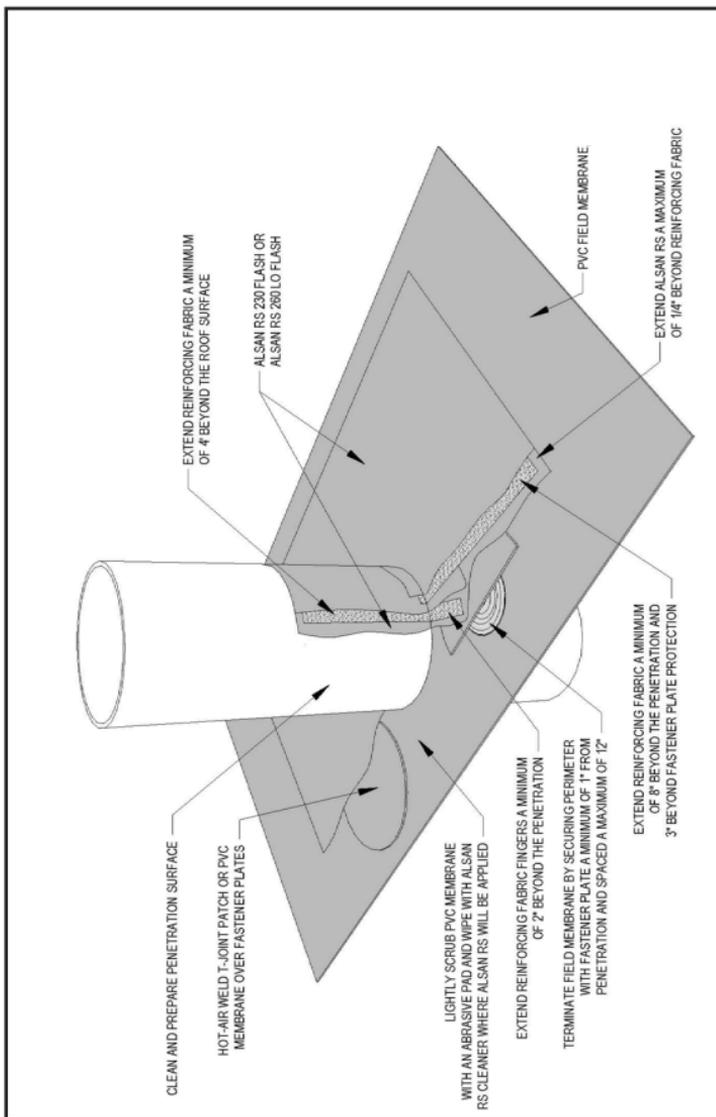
ALSAN RS Penetration Flashing On PVC Membrane With Horizontal Perimeter Fastening
